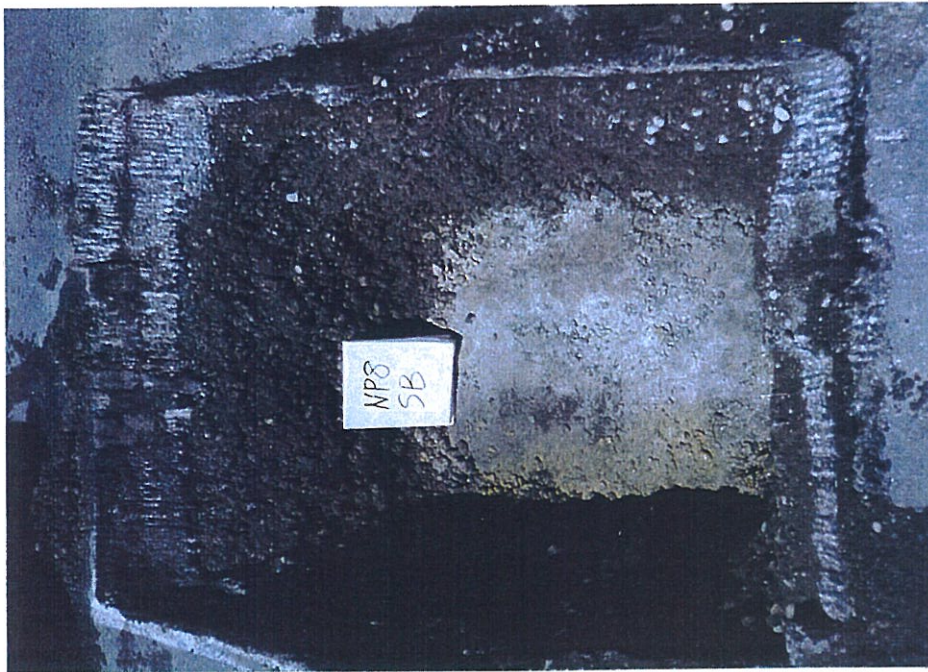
Multicolored iron staining of subgrade soil in NP8-SB excavation after removal of the geotextile.
